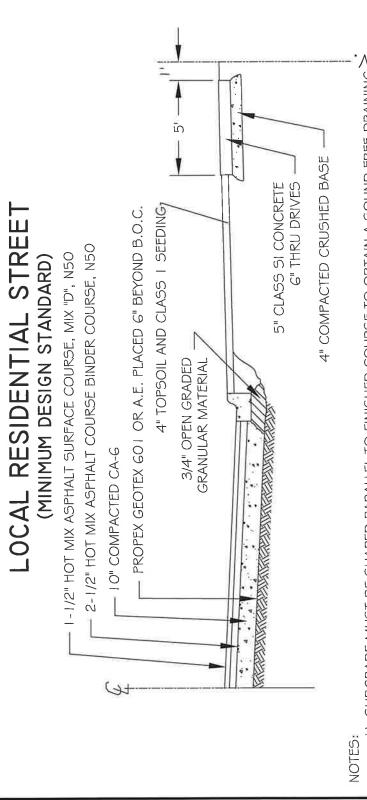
EXHIBIT "K" TYPICAL INTERNAL PUBLIC STREET CROSS SECTION
